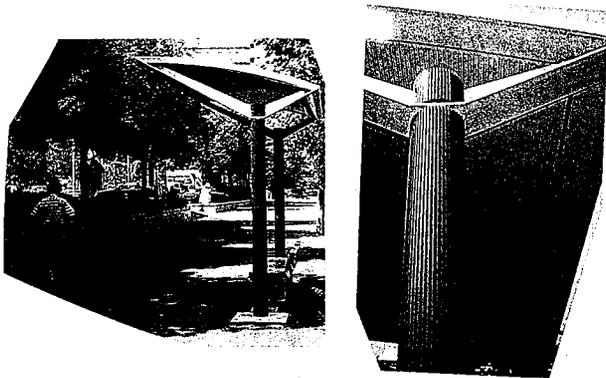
Trapezoidal-fluted steel pipes used as shelter columns
